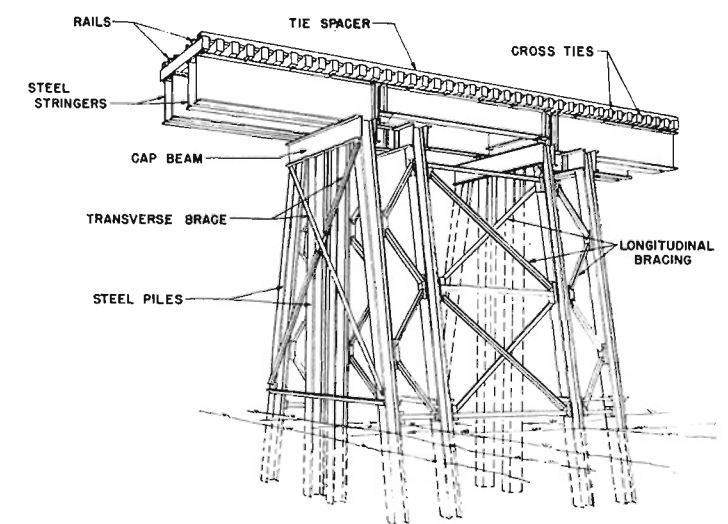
Railway bridge, steel stringers on braced steel pile piers.
